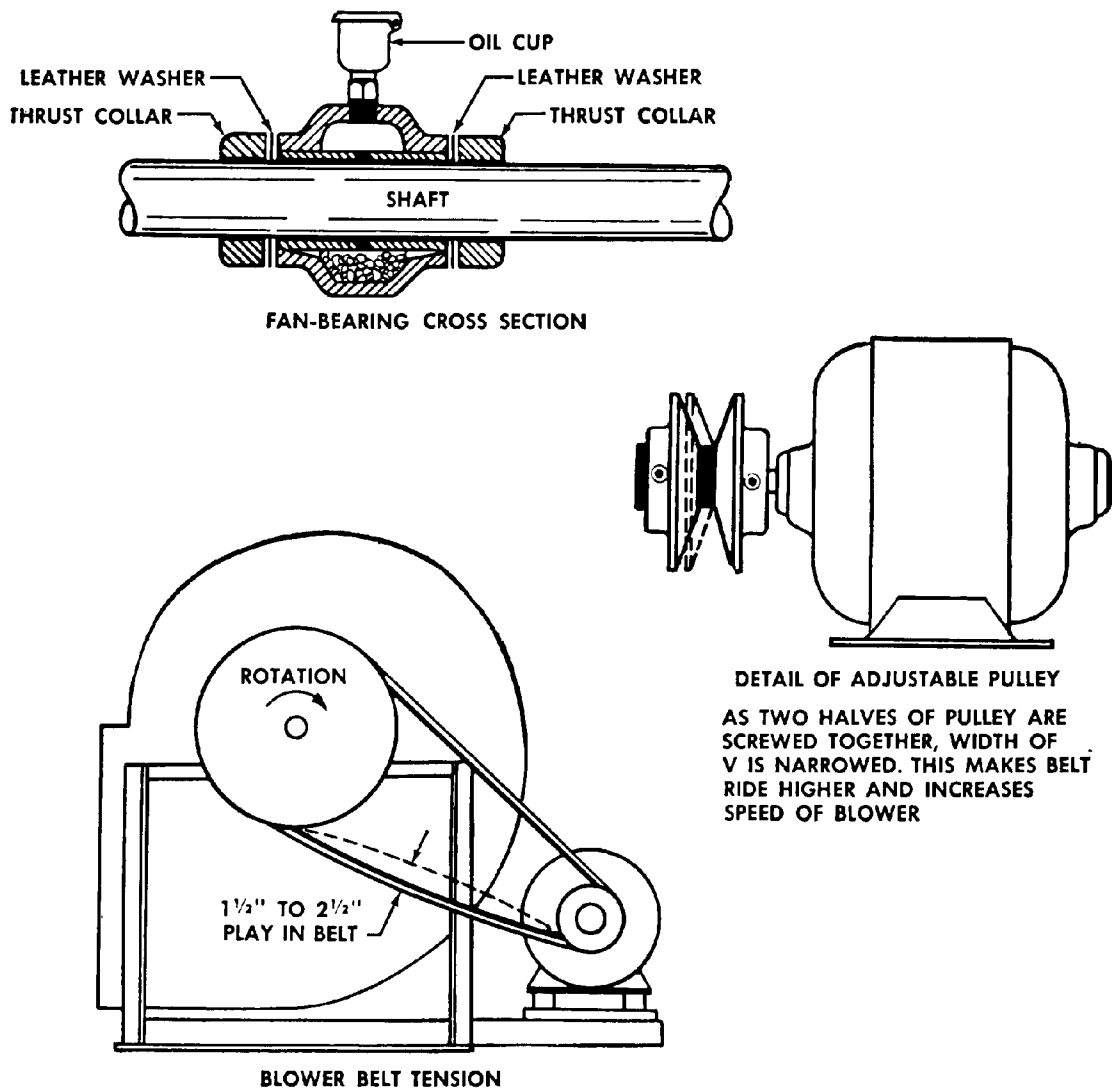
Fan bearing, pulley, and belt adjustments.
